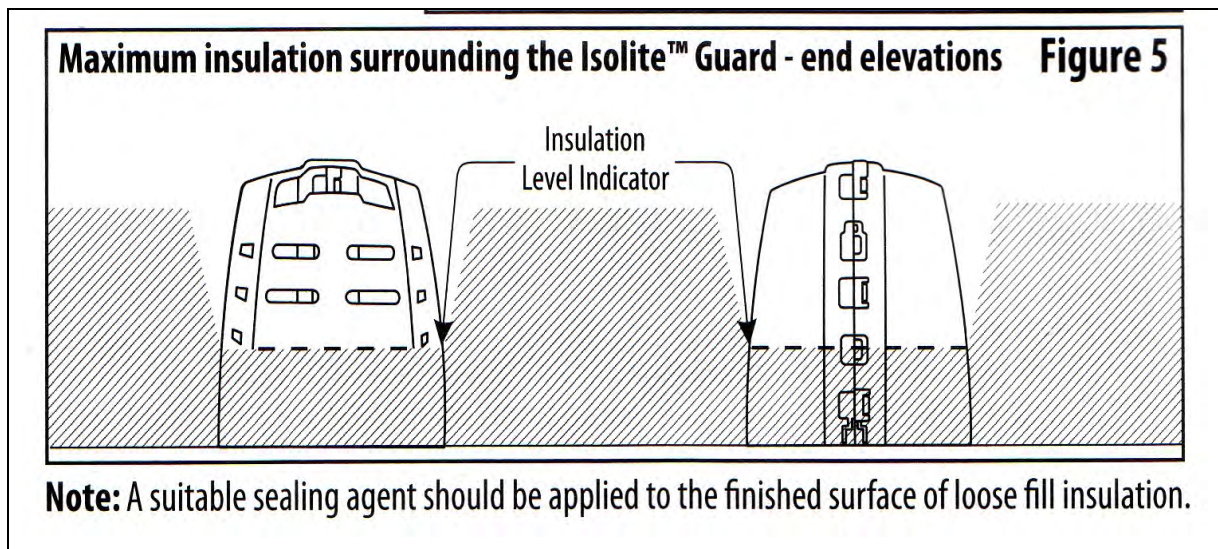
Installation instruction using the Isolite Guard around recessed light fittings (Source: Isolite Installation Instructions for Downlight Guard Model No 1721 & 1942)
